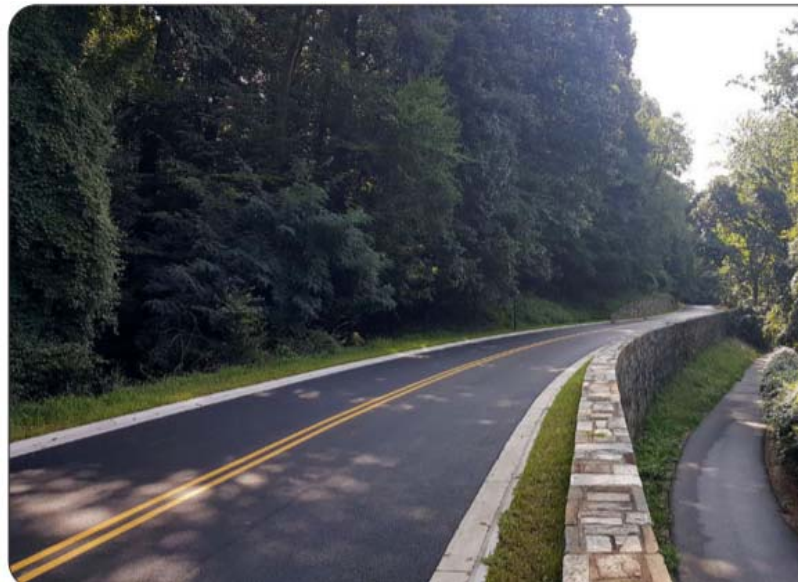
Example NPS Pavement Project: Rock Creek Parkway
